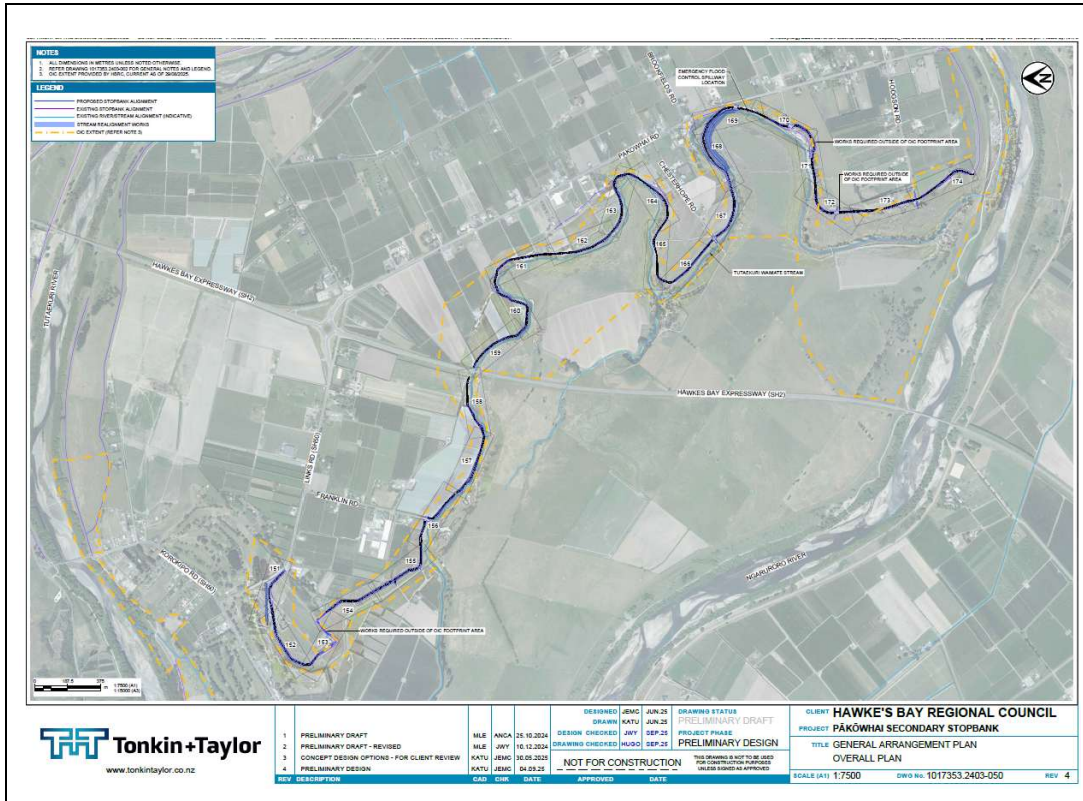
General Arrangement Plan (Source: Tonkin and Taylor)
